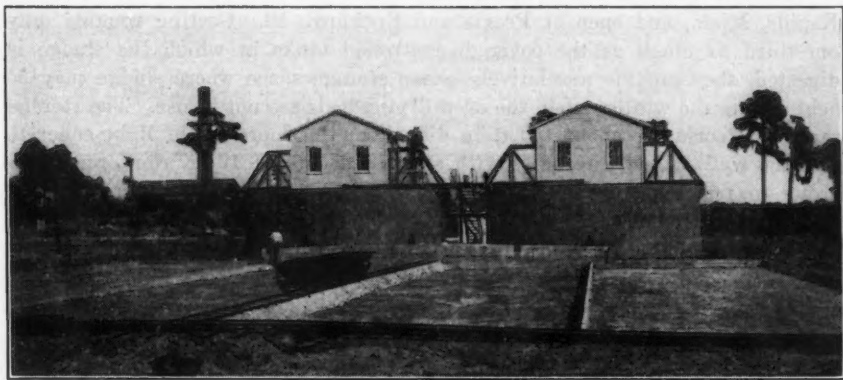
TYPICAL INSTALLATION OF OPEN SLUDGE DIGESTION TANKS WITH ROTARY STIRRING EQUIPMENT, LAKE LAND, FLA.
